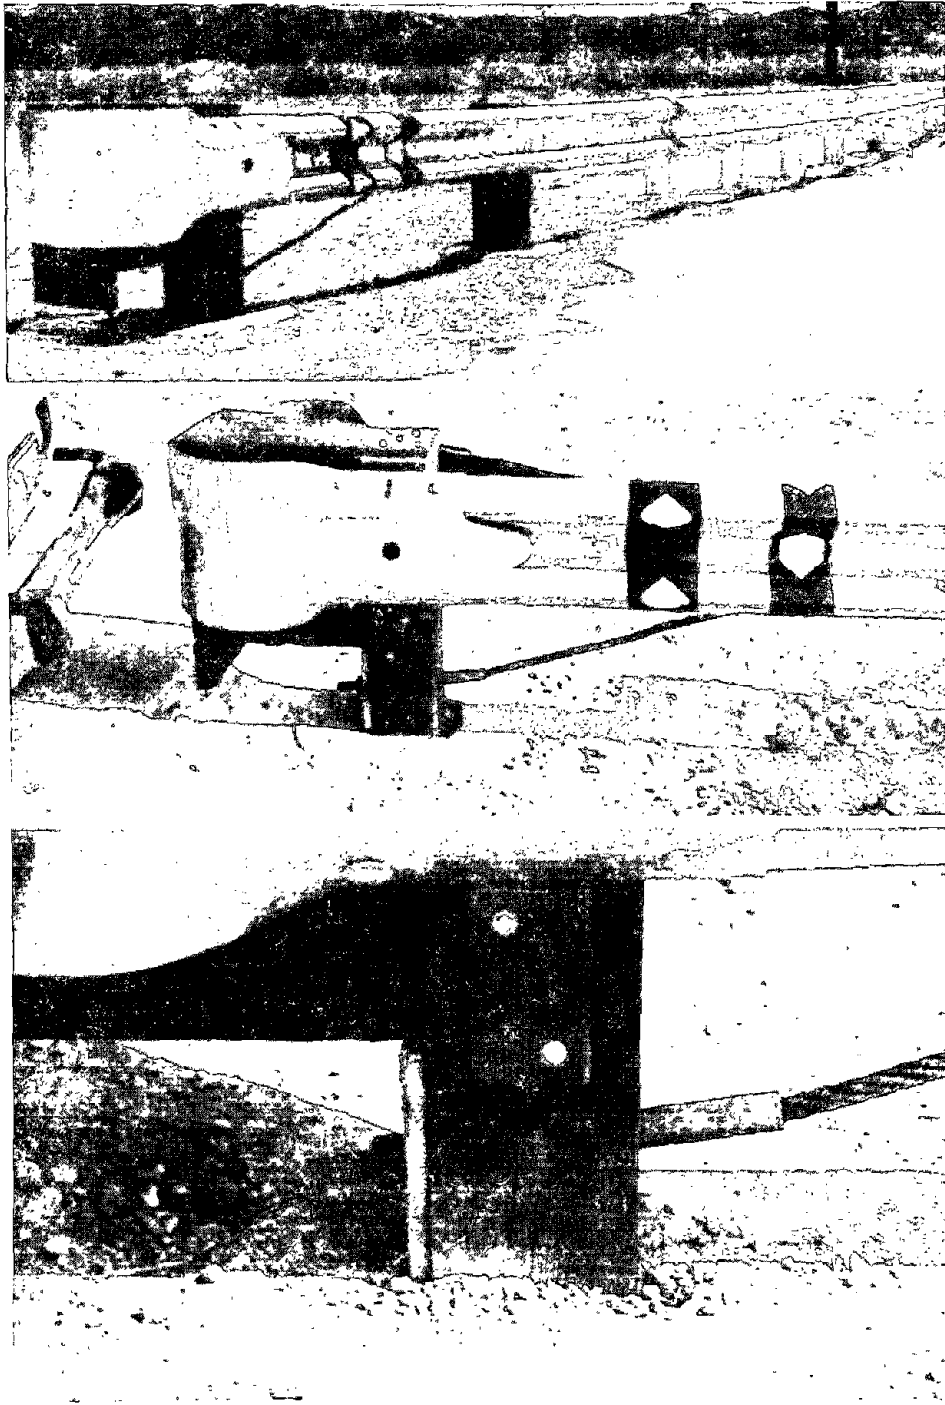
PRE-TEST PHOTOGRAPHS TEST WBCT-8
